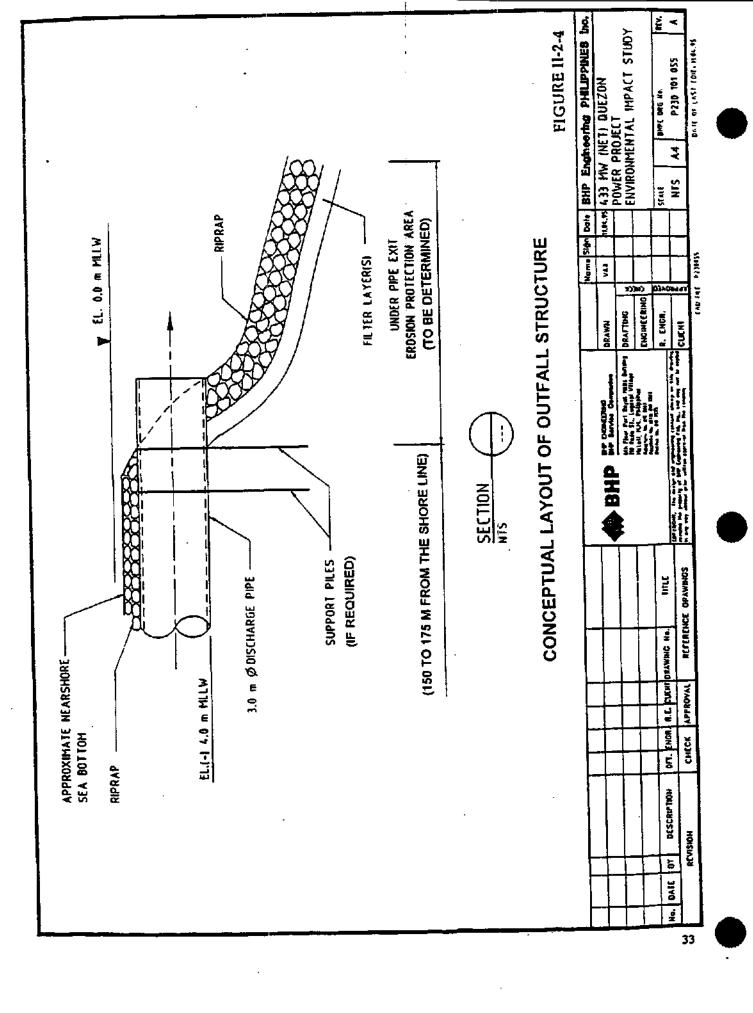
and II-2-4 show the conceptual layout of the off-shore intake and outfall structures.
